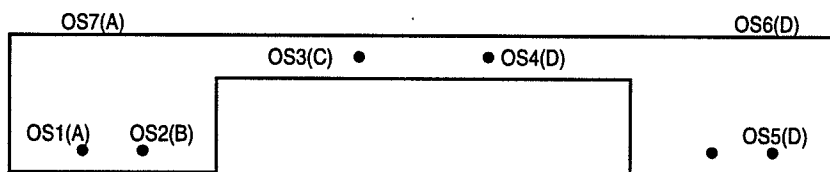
Schematic Drawing of Laboratory Concrete Test Structure.
